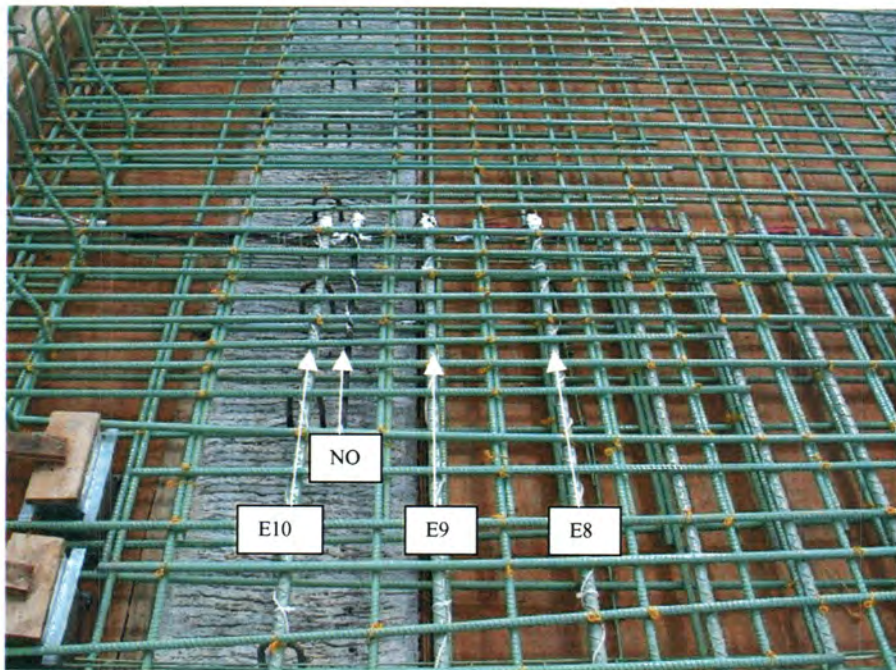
Typical photograph of the instrumentation layout on MMFX bridge.
